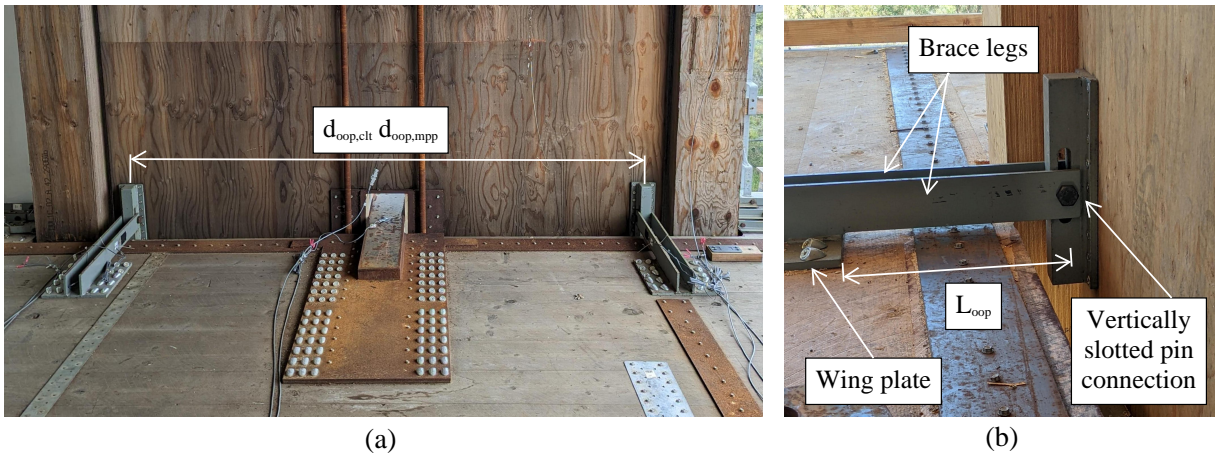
Wall out-of-plane bracing connection photos (a) full view of braces and walls and (b) close up of vertically slotted pin connection on wall
